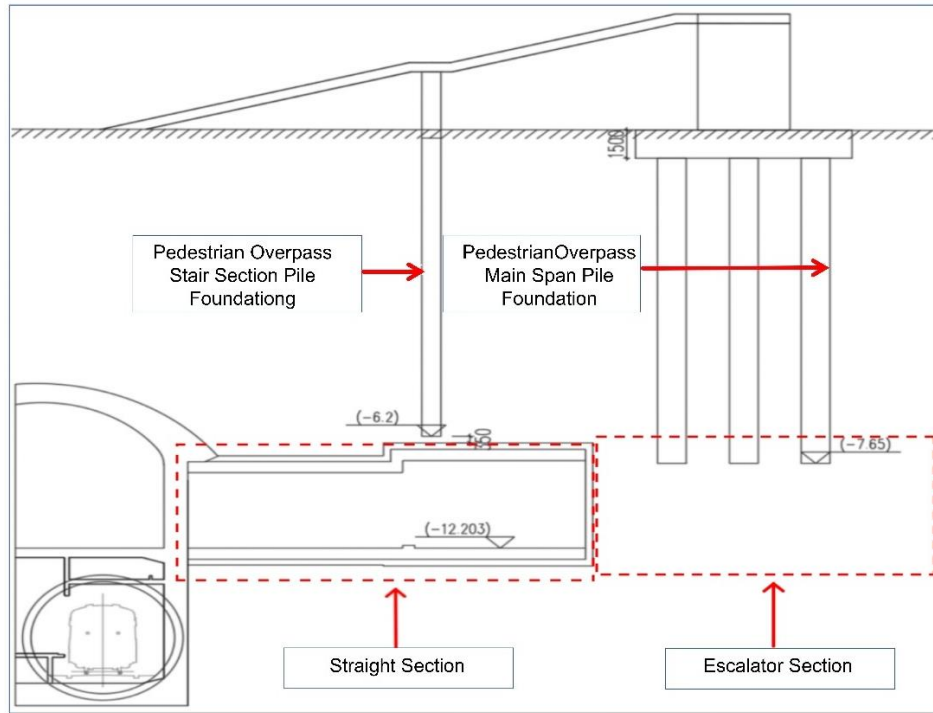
Longitudinal section of pile foundation of subway entrance and exit and pedestrian bridge
